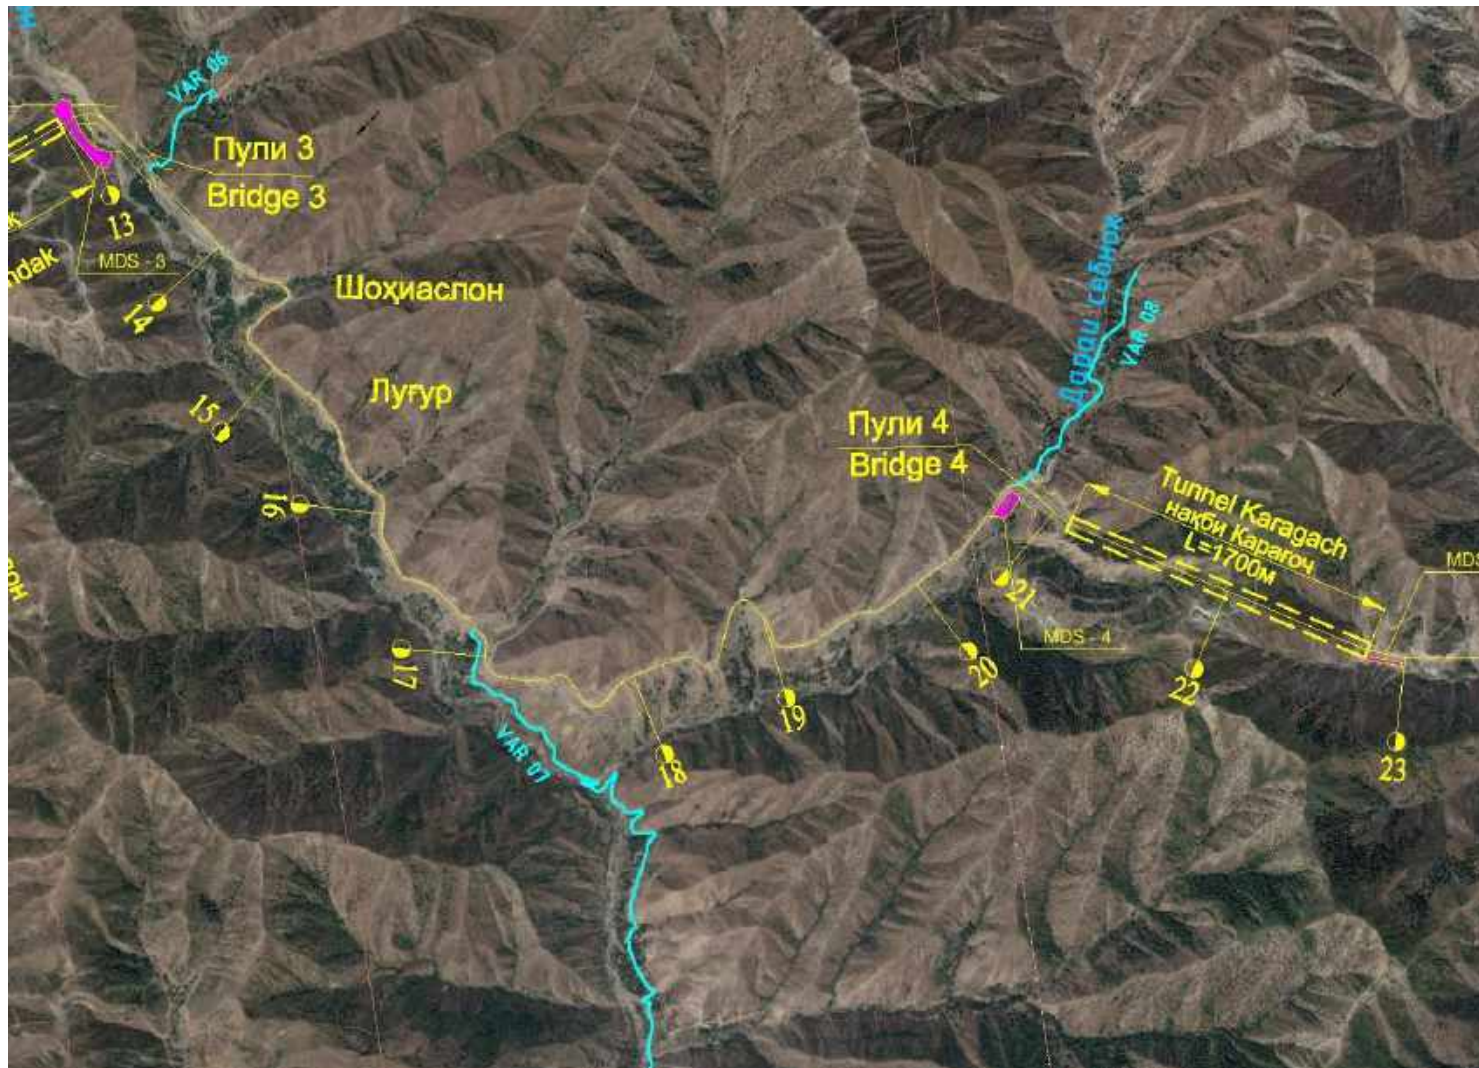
Spoil Disposal Sites (MDS3 to 5) Tunnel 1 to Tunnel 2
